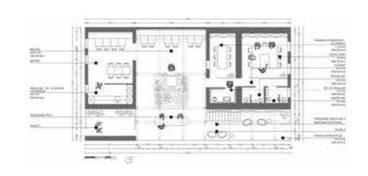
Equipment floor plan with room descriptions - first floor (illustration: Demetra Jarc)
